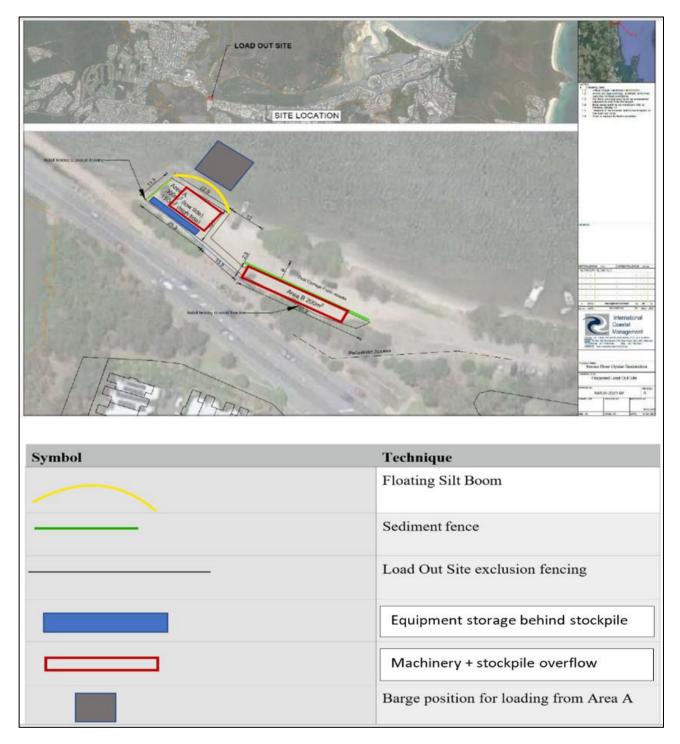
Construction load-out site located on Hilton Esplanade, Noosaville.
